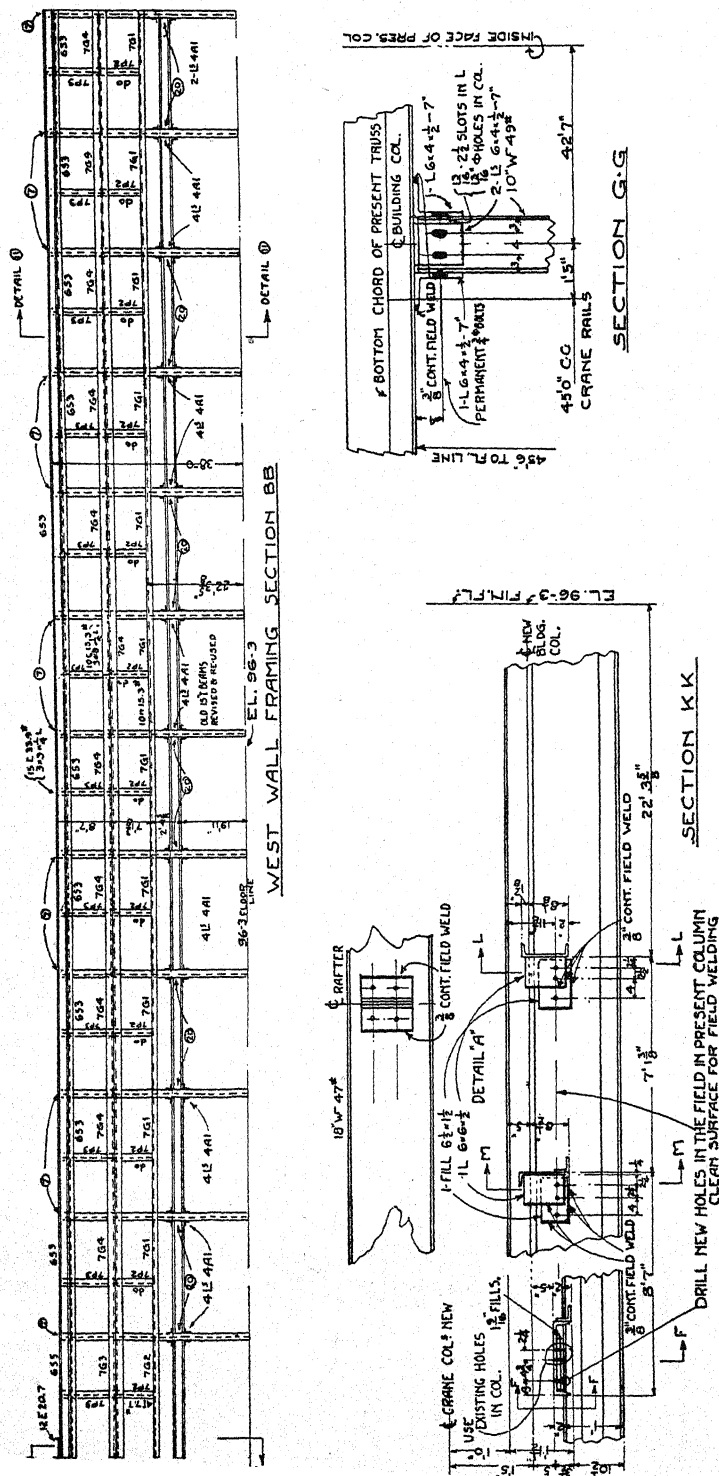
Additional details of the arc welded building. See also pages 484a and 484c.
